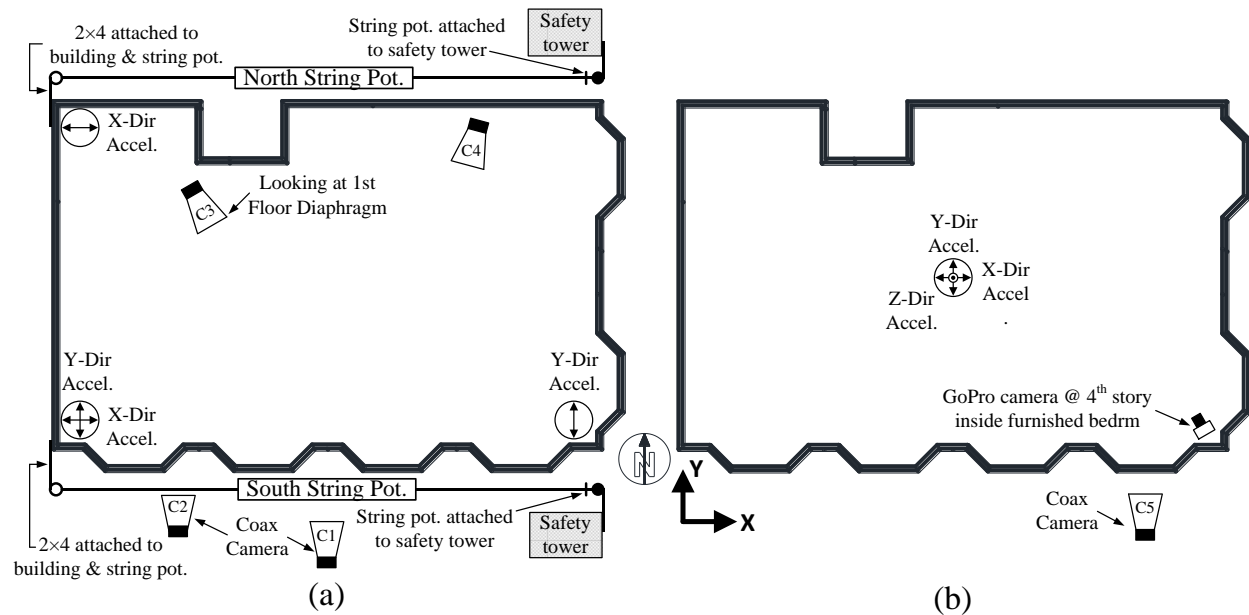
Instrumentation plan: (a) first story, and (b) fourth story.
